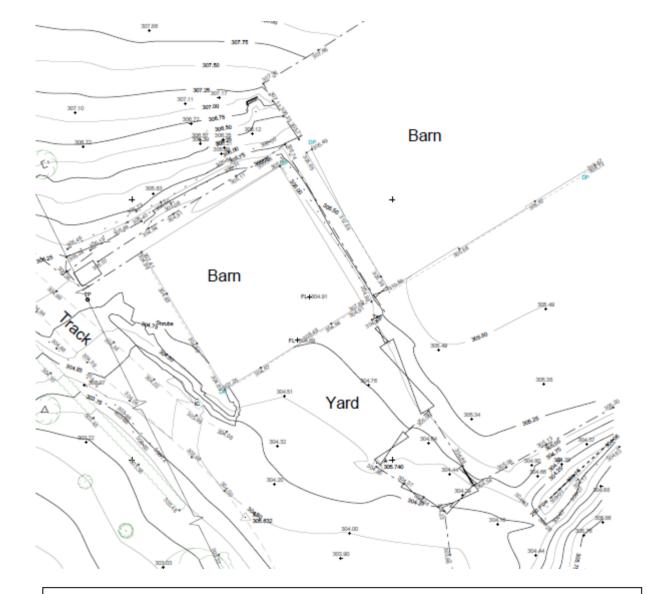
Extract from STE21S-02-95-001 Existing Site Plan, showing the barn subject of this proposal together with a second in this part of Carterhouse Farm (Source: CB3 Design Architects).
